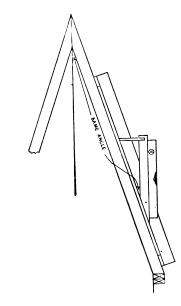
Method Employed for "Plumbing" the Tower Roof with Level and Straight Edge.
